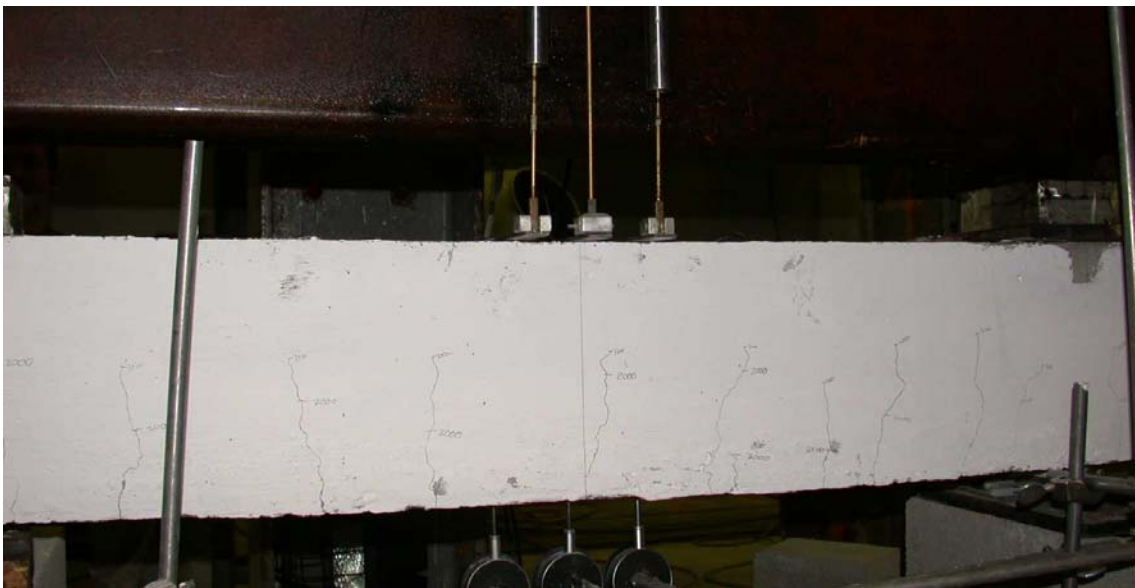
Cracking in Center of Span of Beam P-2 at 2000 and 3000 lbs.
